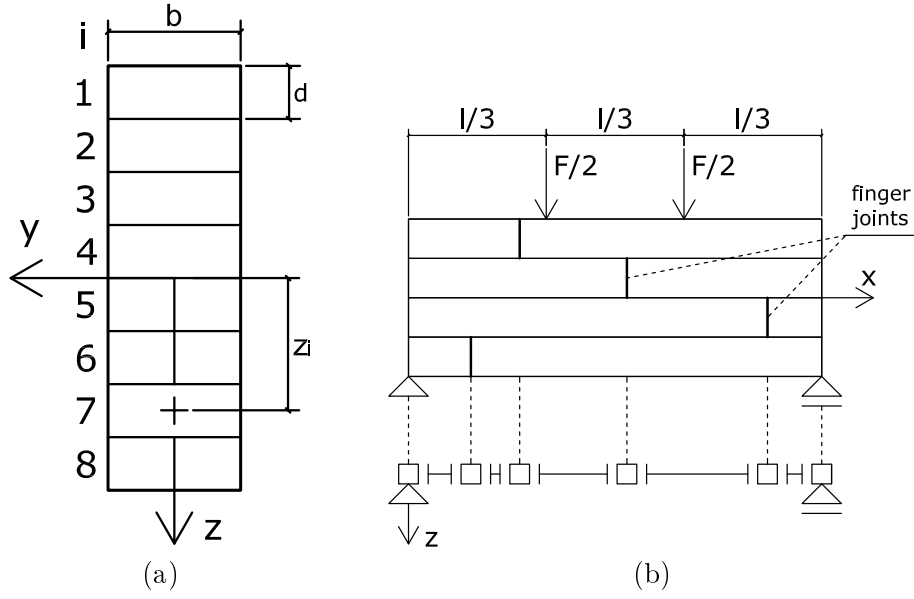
a) Geometry of the laminated timber beam cross-section, b) Model of laminated timber beam (note that rectangles denote nodes and the connecting lines denote elements)
